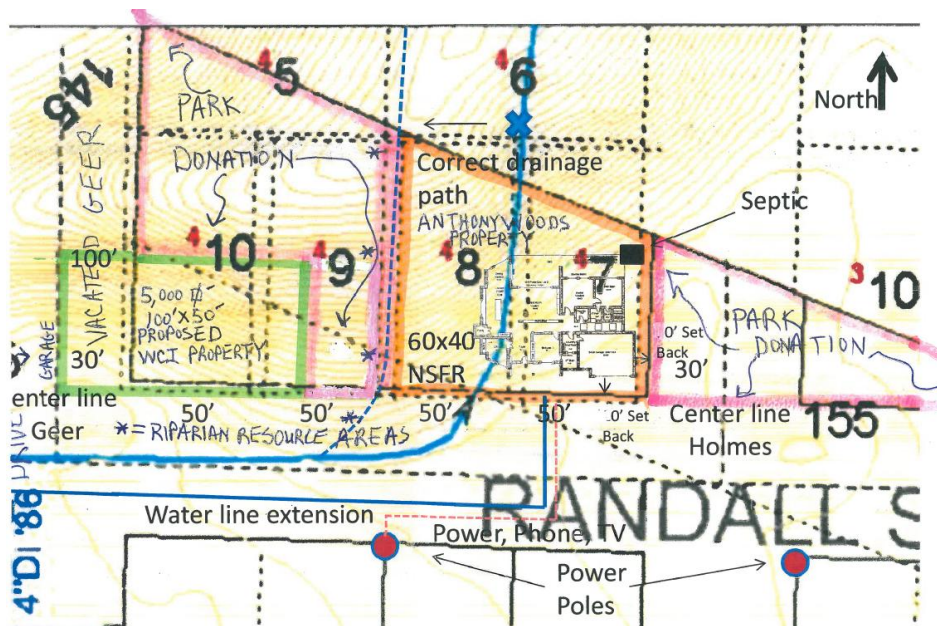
Applicant's drawing/plan. (Staff note: Geer Street has not been vacated. Also, the drainage channel, as shown, is incorrect.)
